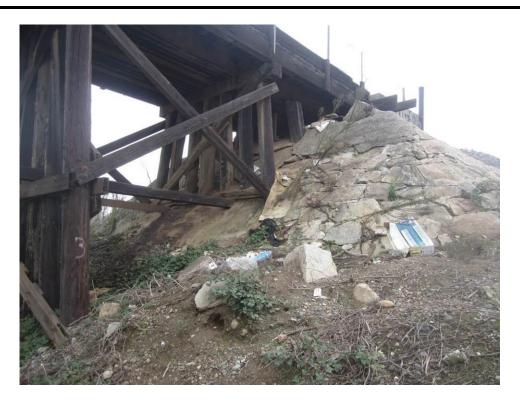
View of TT North upstream face abutment, looking TT West.
